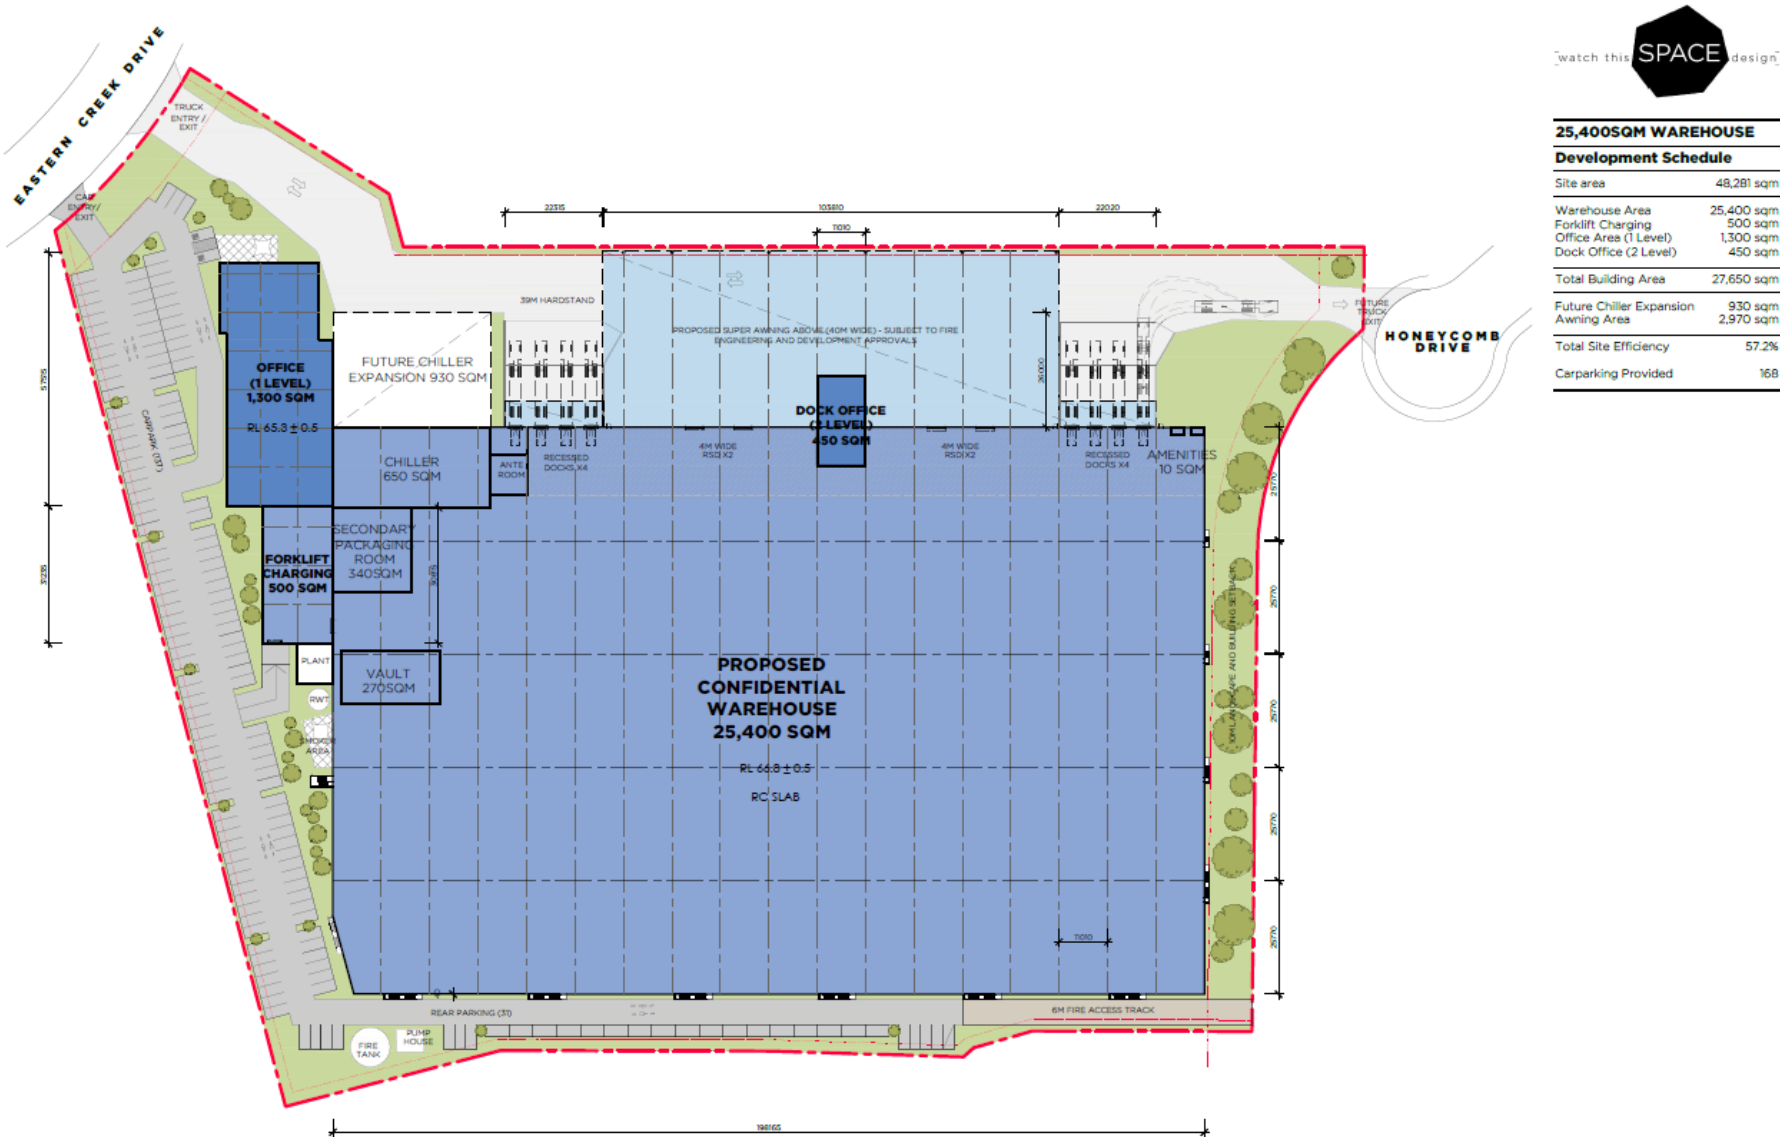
Site Proposal Plan (Source: Watch This Space Design, 2021)
